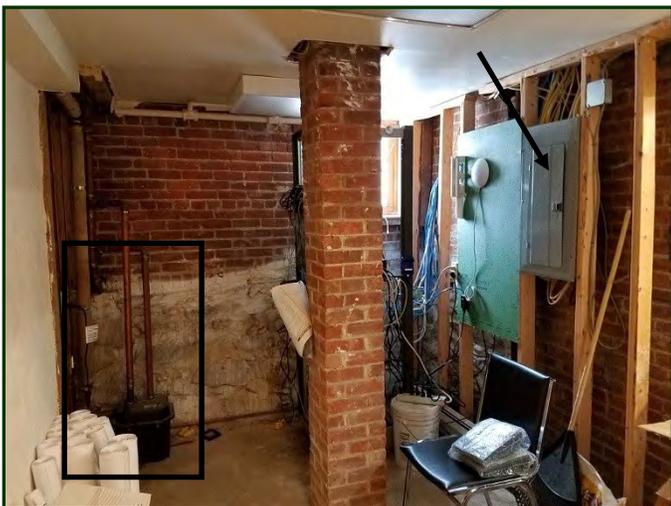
IT Room, electric panel on right hand side; IT equipment behind column; sink pump ejector system on floor near left side
